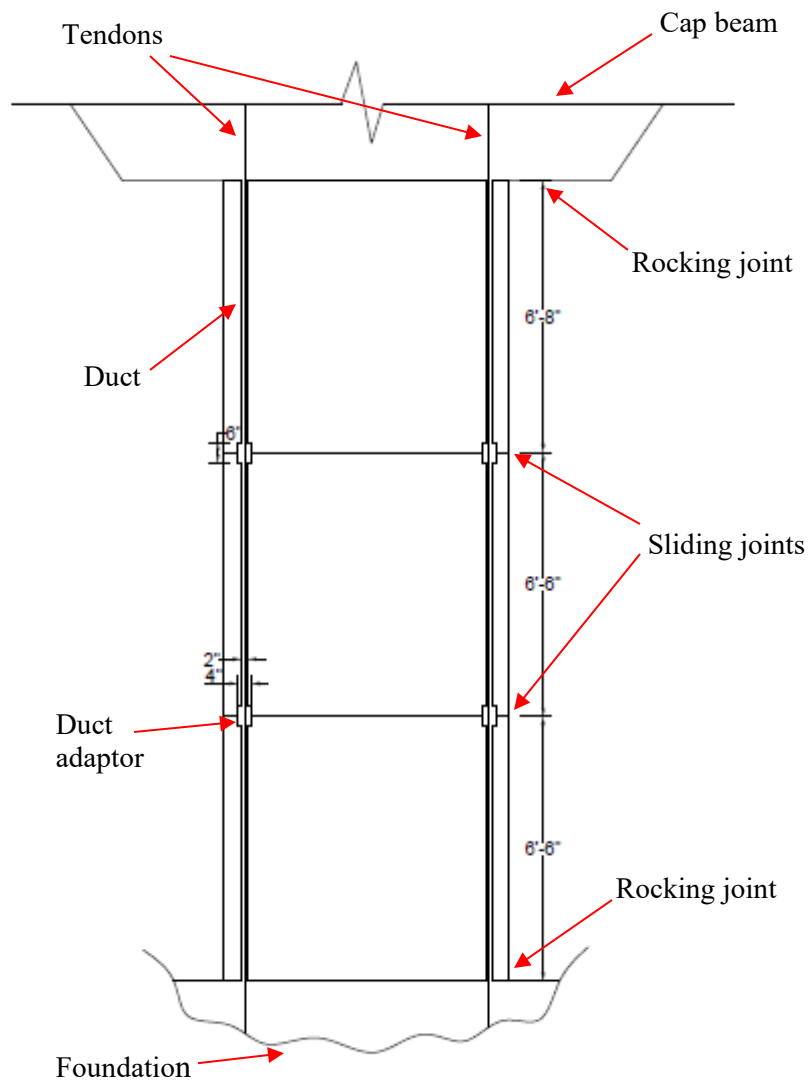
Schematic section view of the HSR column for Bridge-A
